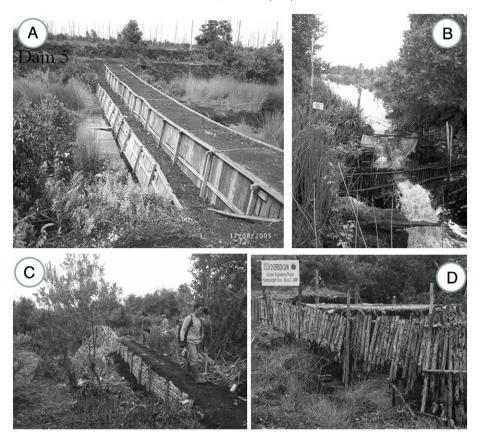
A: Dam (No. 5) without spillway just after construction; B: Dam (No. 1) with spillway 2 years after construction after a heavy rainfall event; C: Dam (No. 3) with side wings after construction; and D: Dam (No. 3) with side wings damaged after a heavy rainfall event.
